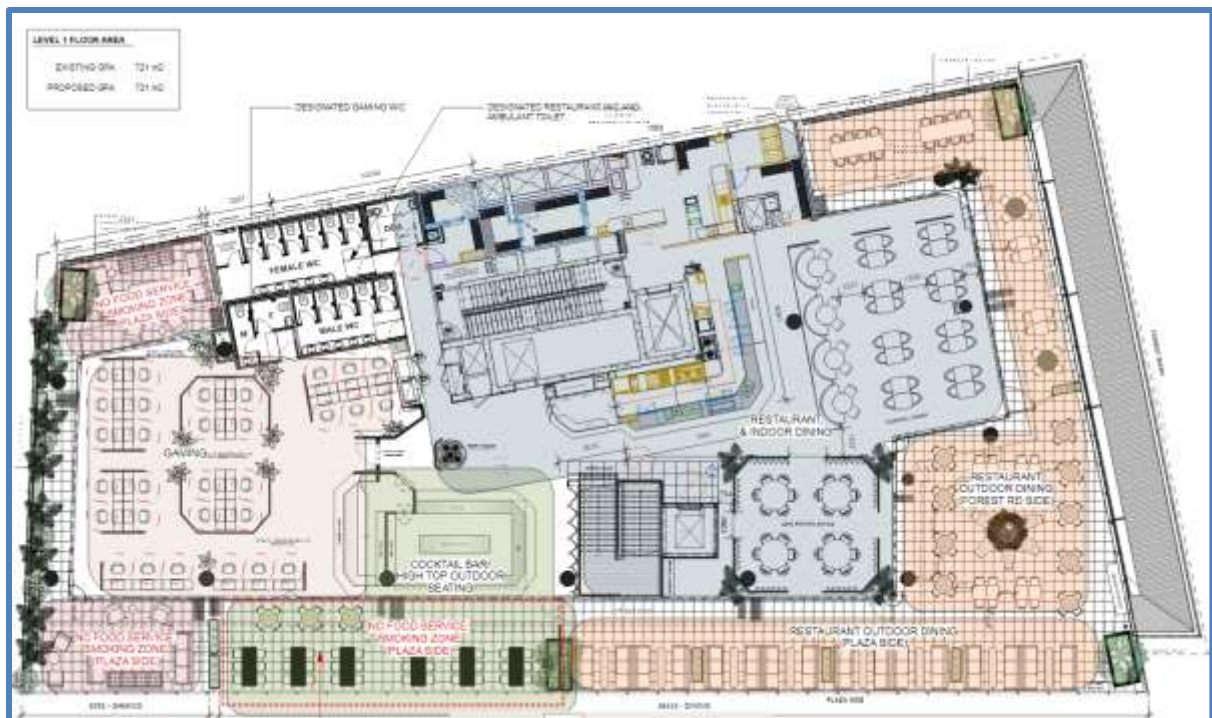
Floor Plan – Level 1 showing areas of the proposed pub.
